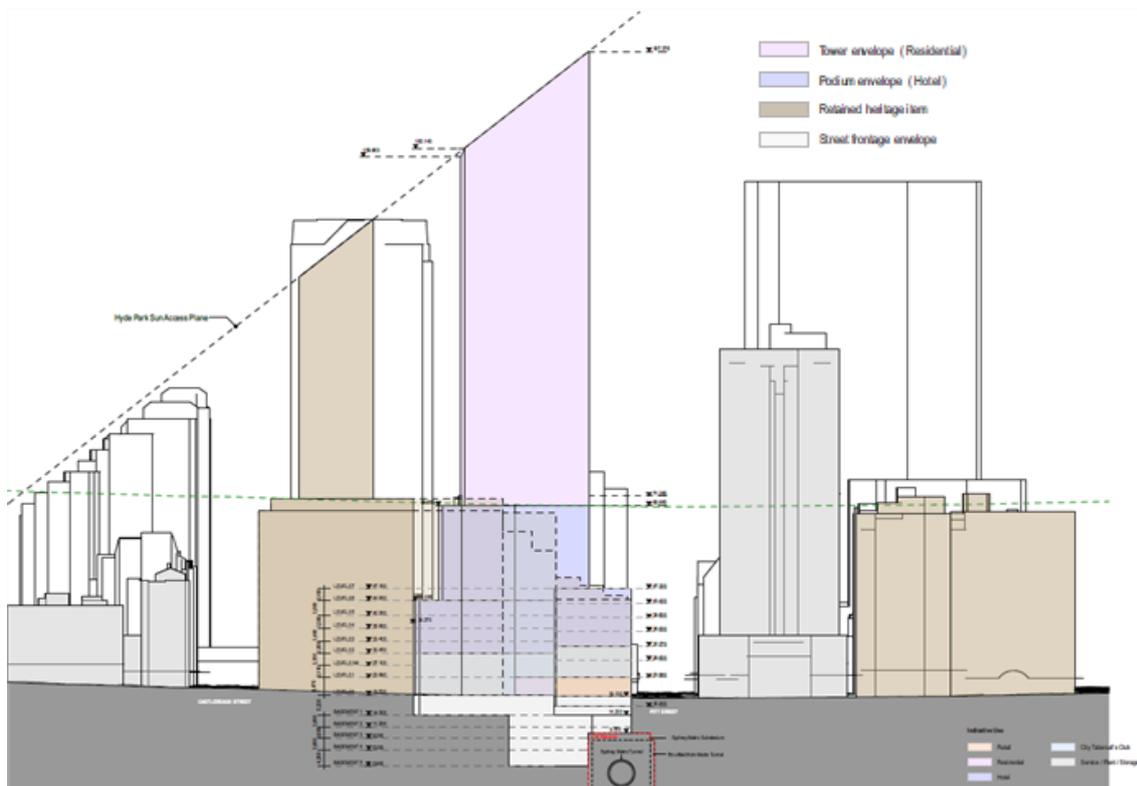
Envelope elevation to Market St showing sun access plane compliance.
